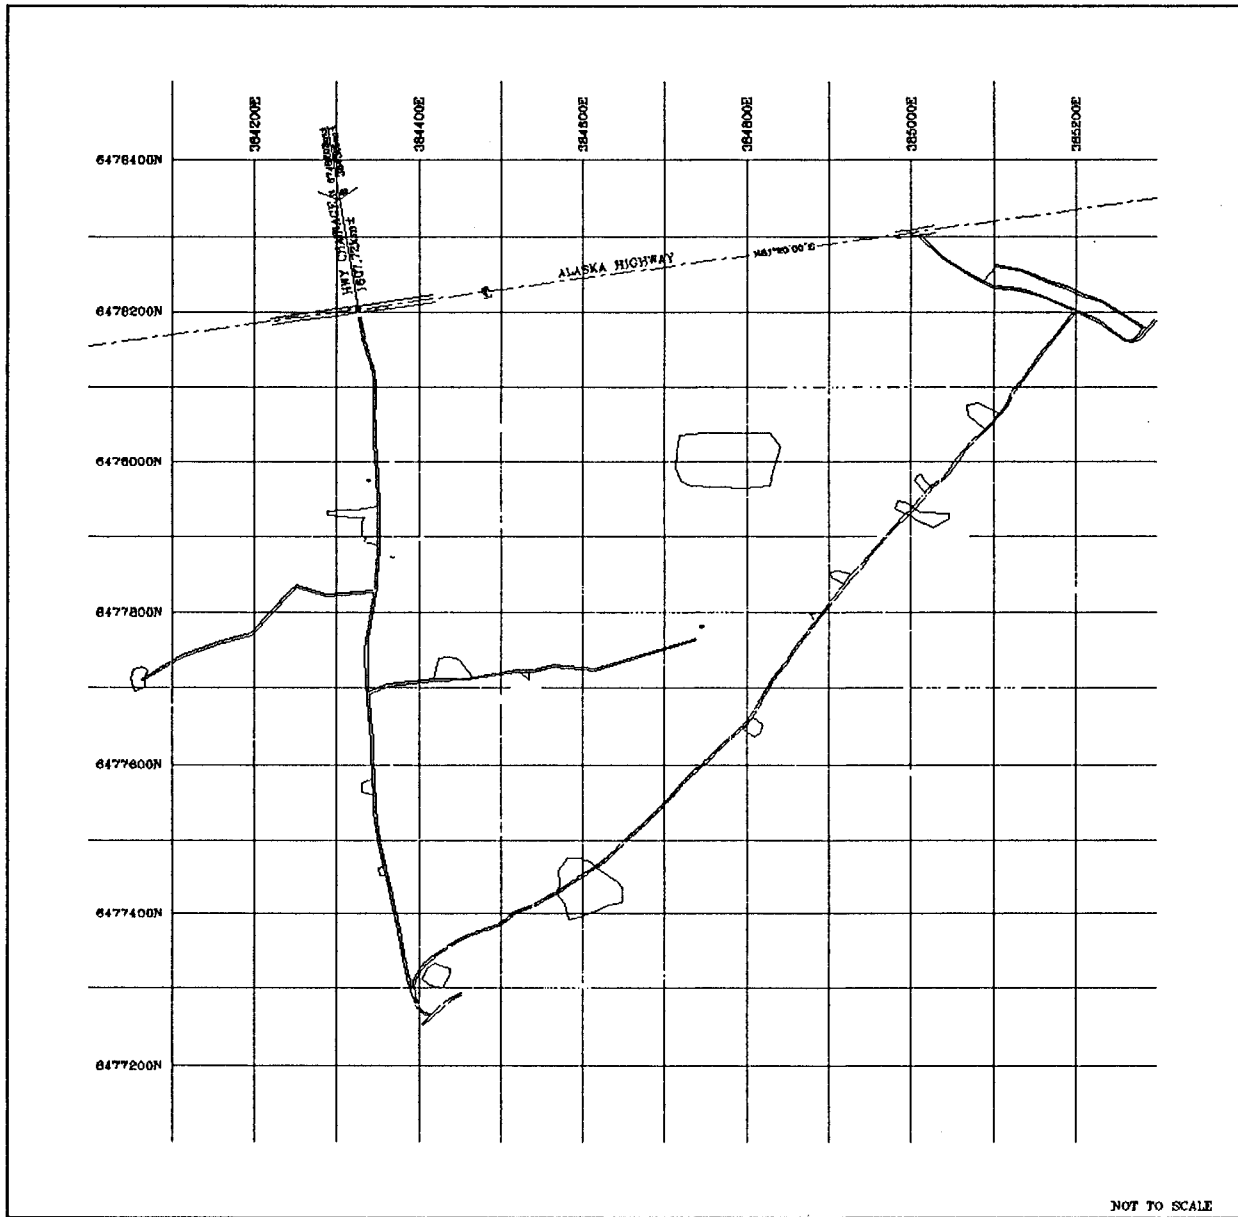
Detailed site plan for sub-site 20B on the southwest corner of Site 20 - Canyon Creek west
